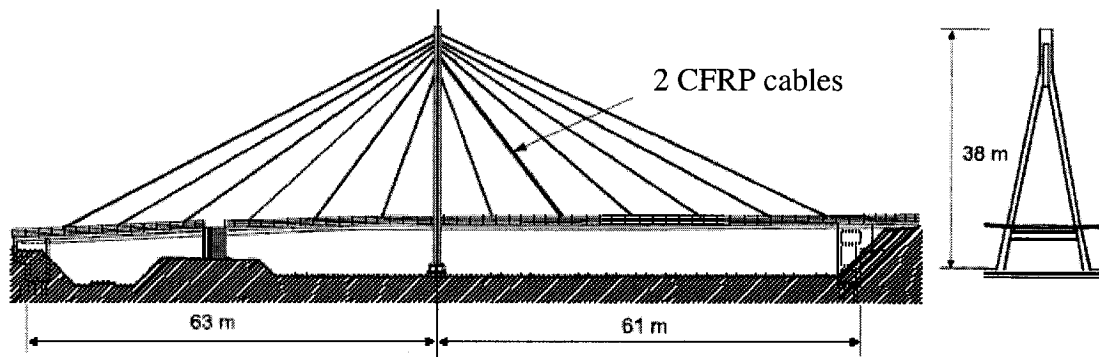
Two CFRP cables are using in Stork Bridge [3].
